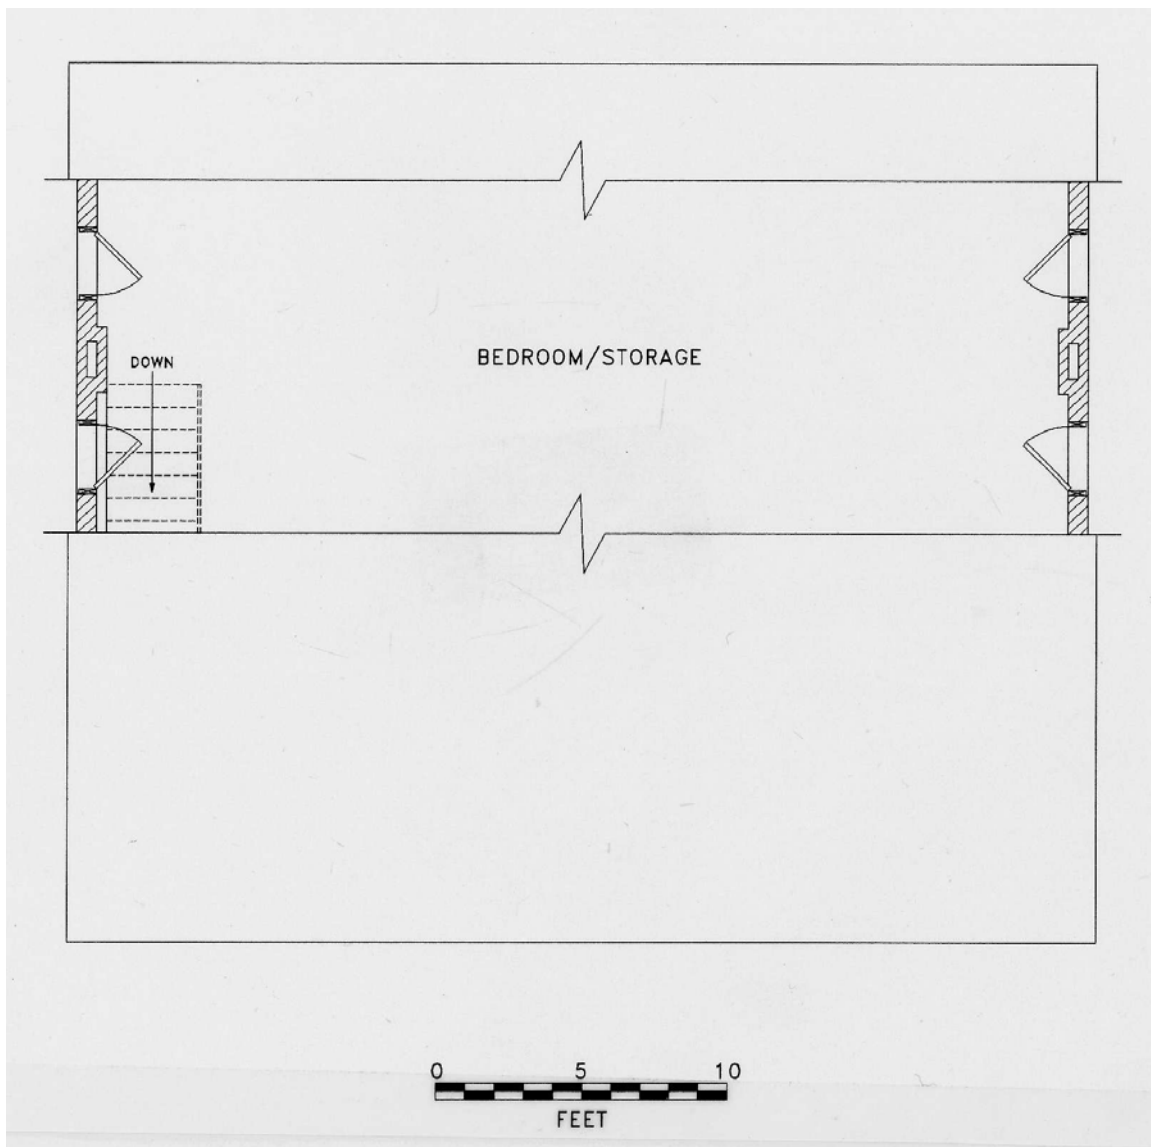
Second floor plan of the Valentine House as originally constructed (circa 1855).
